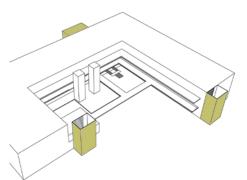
Stairwells are added to help create additional shear capacity. The stairwells also provide internal staff circulation between departments. (Alison Dahlson)
